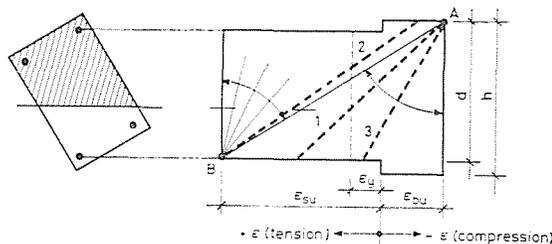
Cross section deformations satisfying the conditions of bearing capacity critical state. Distribution  $\epsilon$  through point "A": concrete failures. Distribution  $\epsilon$  through point "B": steel failures
